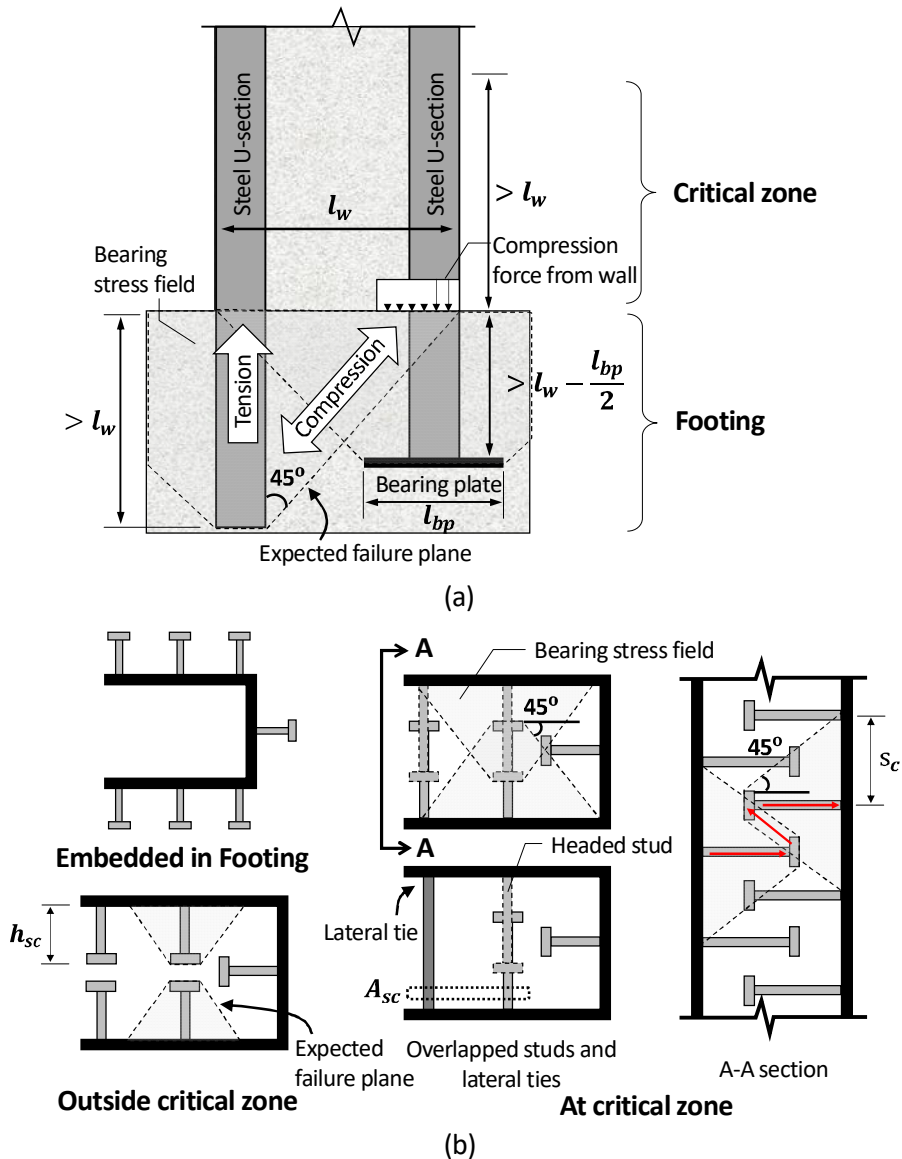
Recommended details of (a) anchorage; and (b) steel anchors of steel U-sections.
